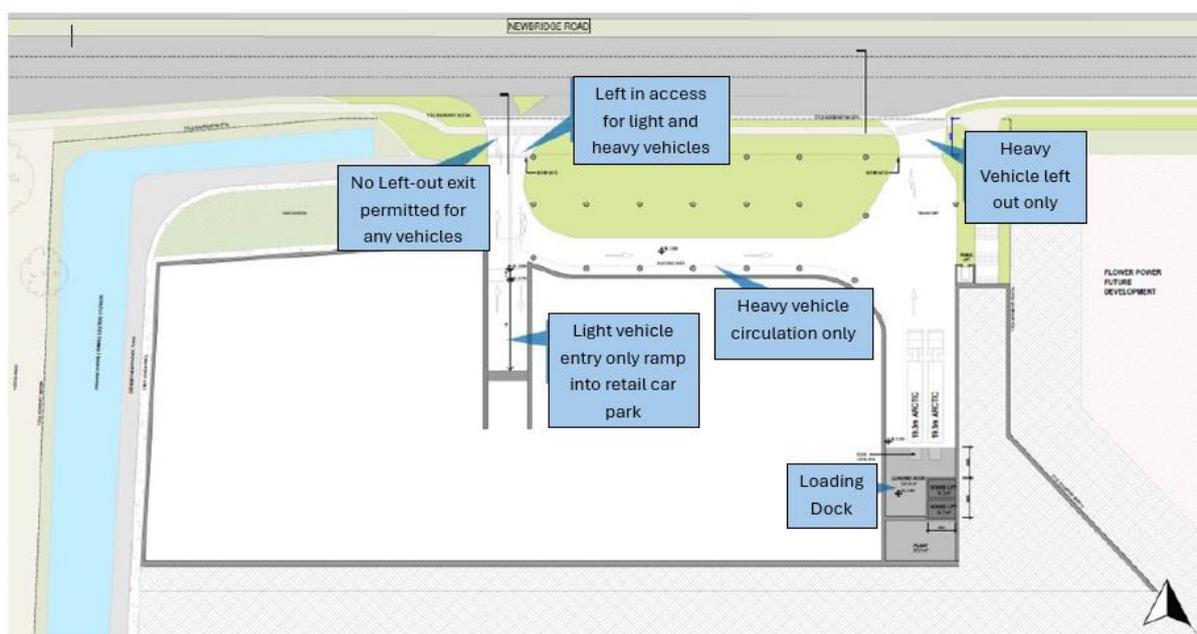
Newbridge Road proposed light and heavy vehicle entry/exit points. Source: Addendum Traffic Impact Assessment Report prepared by EMM Consulting.
